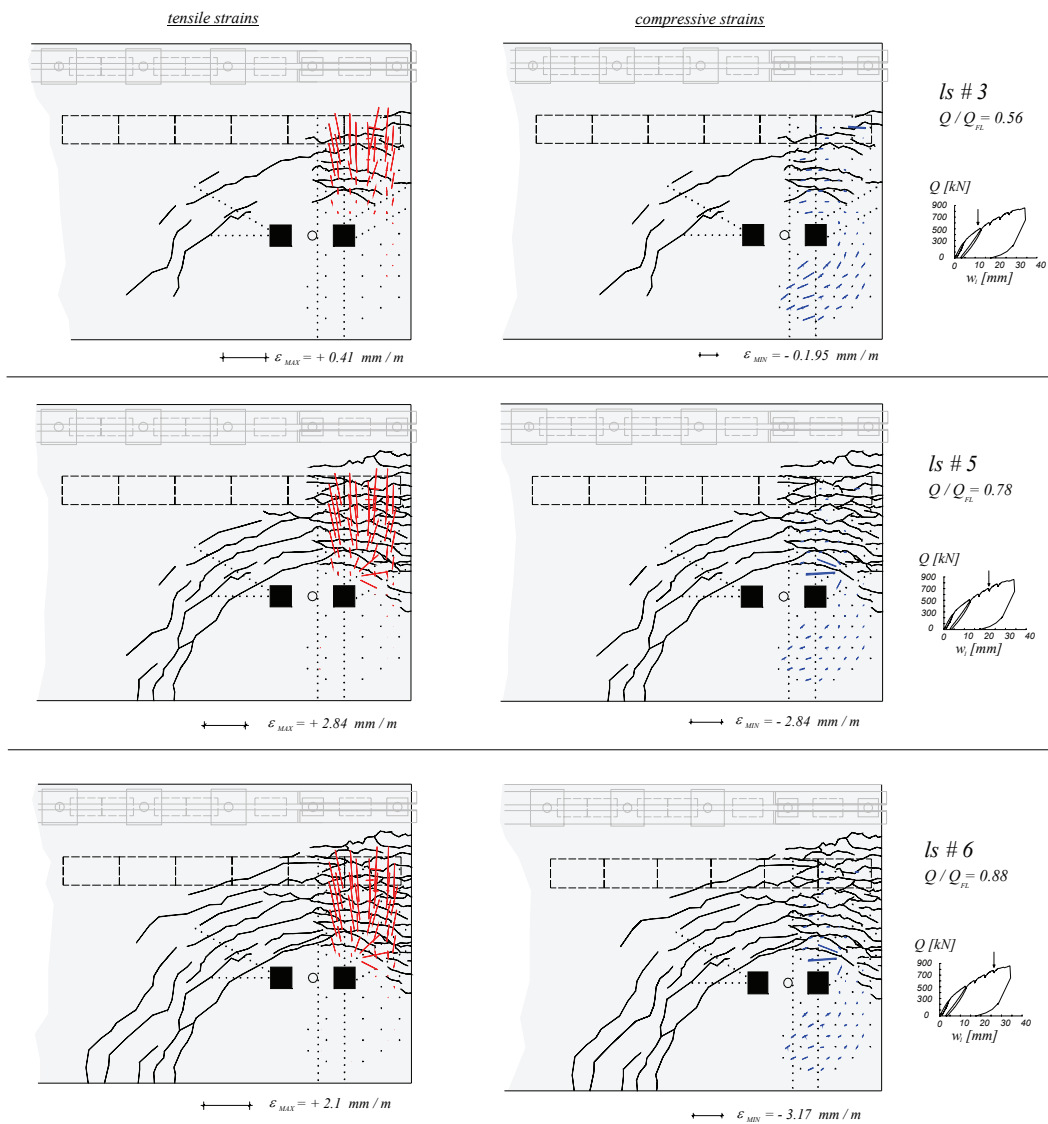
Test DR2-b: Crack pattern and principal strains on the top surface
